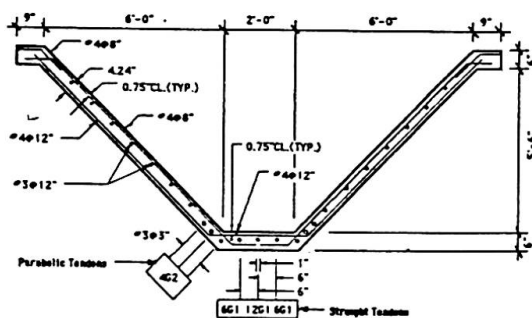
Cross-Section of the Model with Reinforcements (1 in = 25.4 mm)
